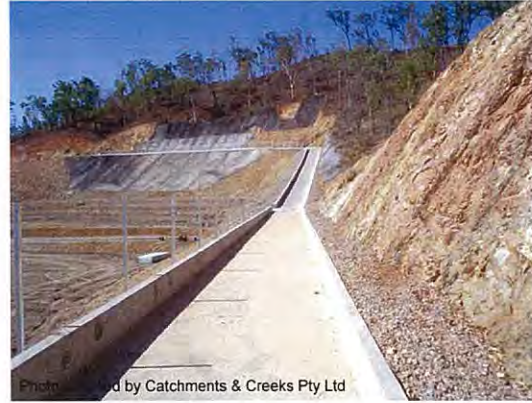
Permanent diversion channel collecting stormwater runoff up-slope of a subdivision
